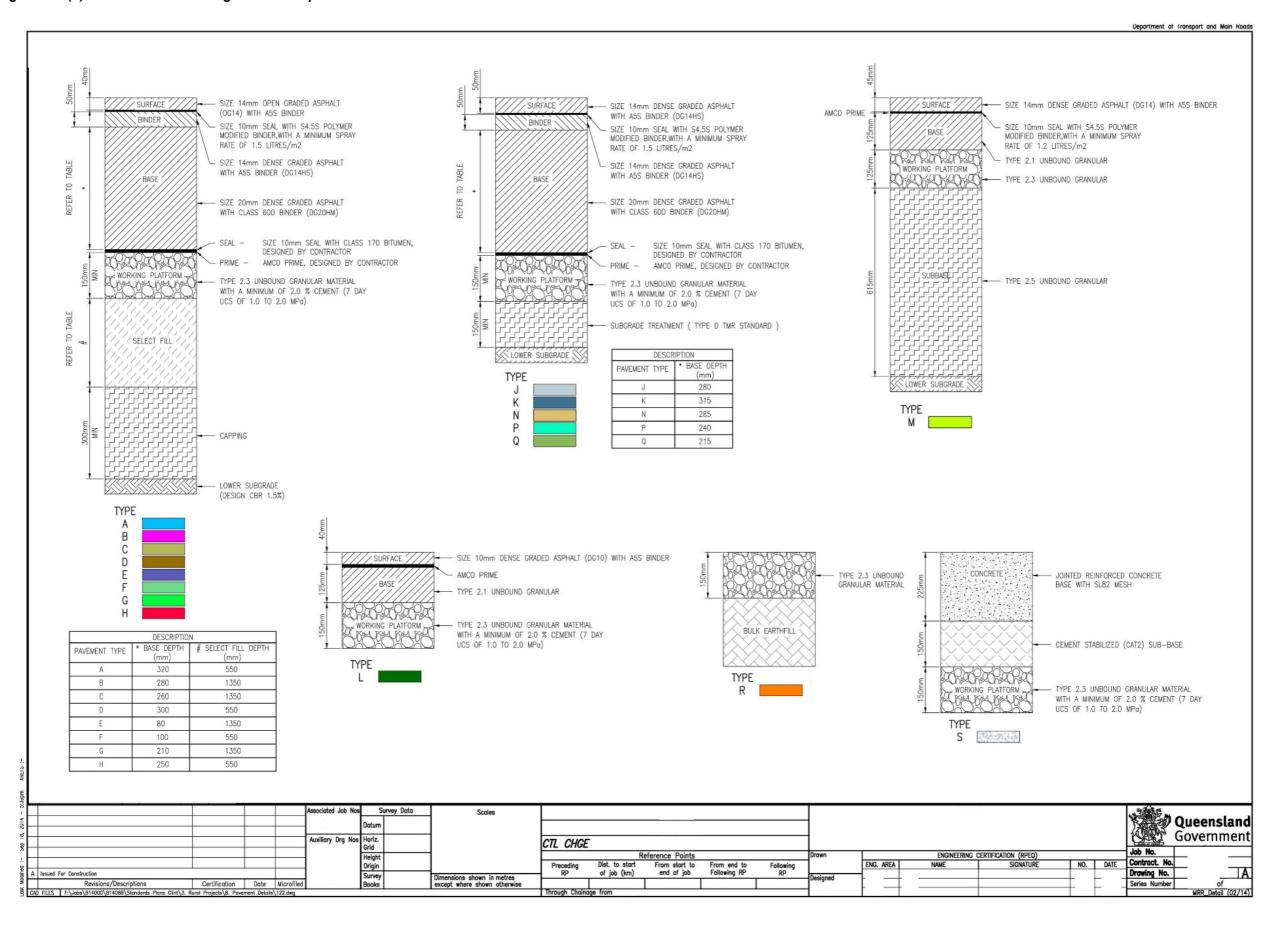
(e) – Pavement details – generic example 4 – sheet 2 of 2
